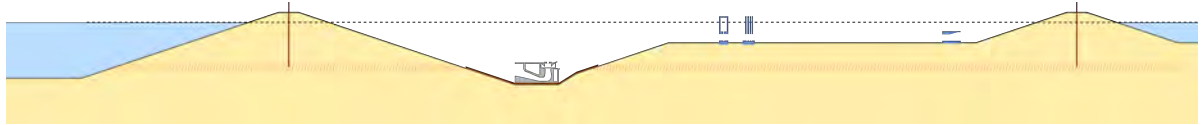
In-situ construction of pumphouse, emergency gate housing, and sea-side inlet
